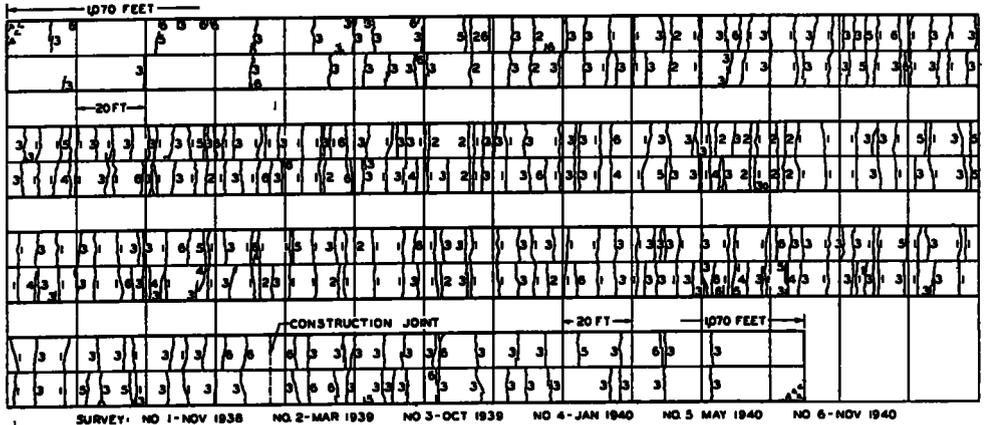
Typical crack survey sheet for long sections reinforced with one-inch diameter steel. Sections placed September-October, 1938
